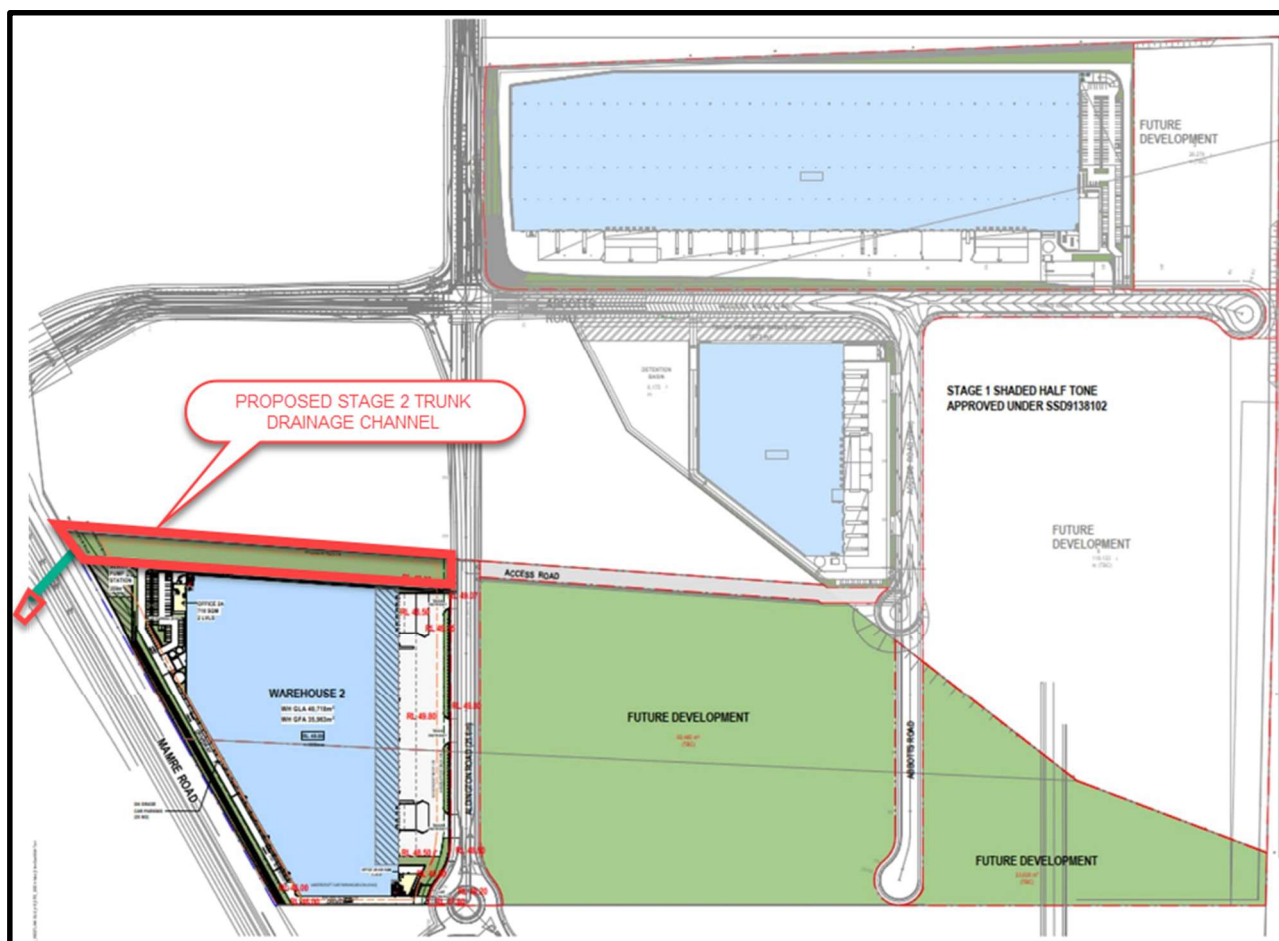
Westlink Stage 2 Proposed Development (Source: AT&L Civil Plans)
